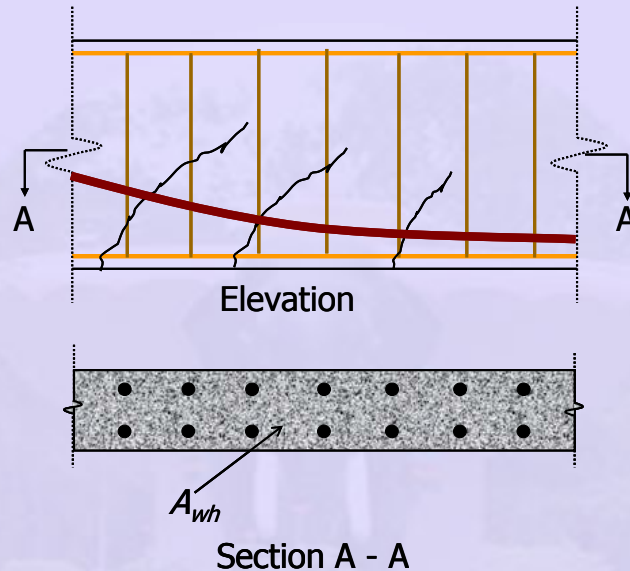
Elevation and horizontal section of a beam showing stirrups
